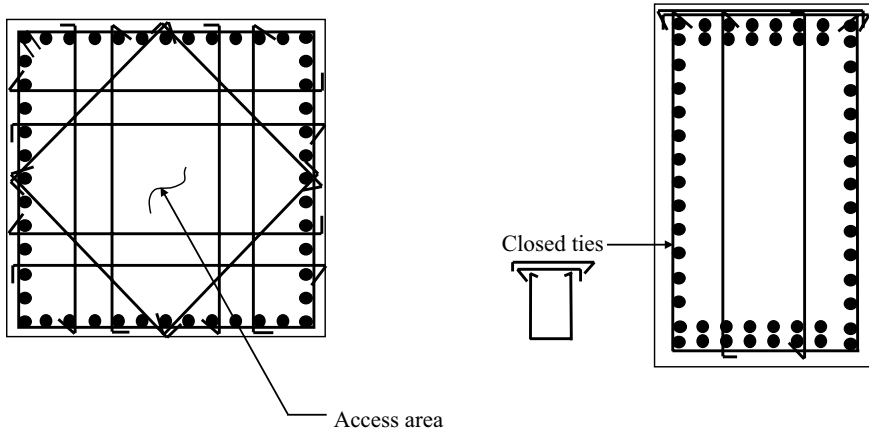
Example of a column tie reinforcing arrangement to allow access inside the rebar cage (left); example of a tabletop beam torsion tie reinforcing (right)
